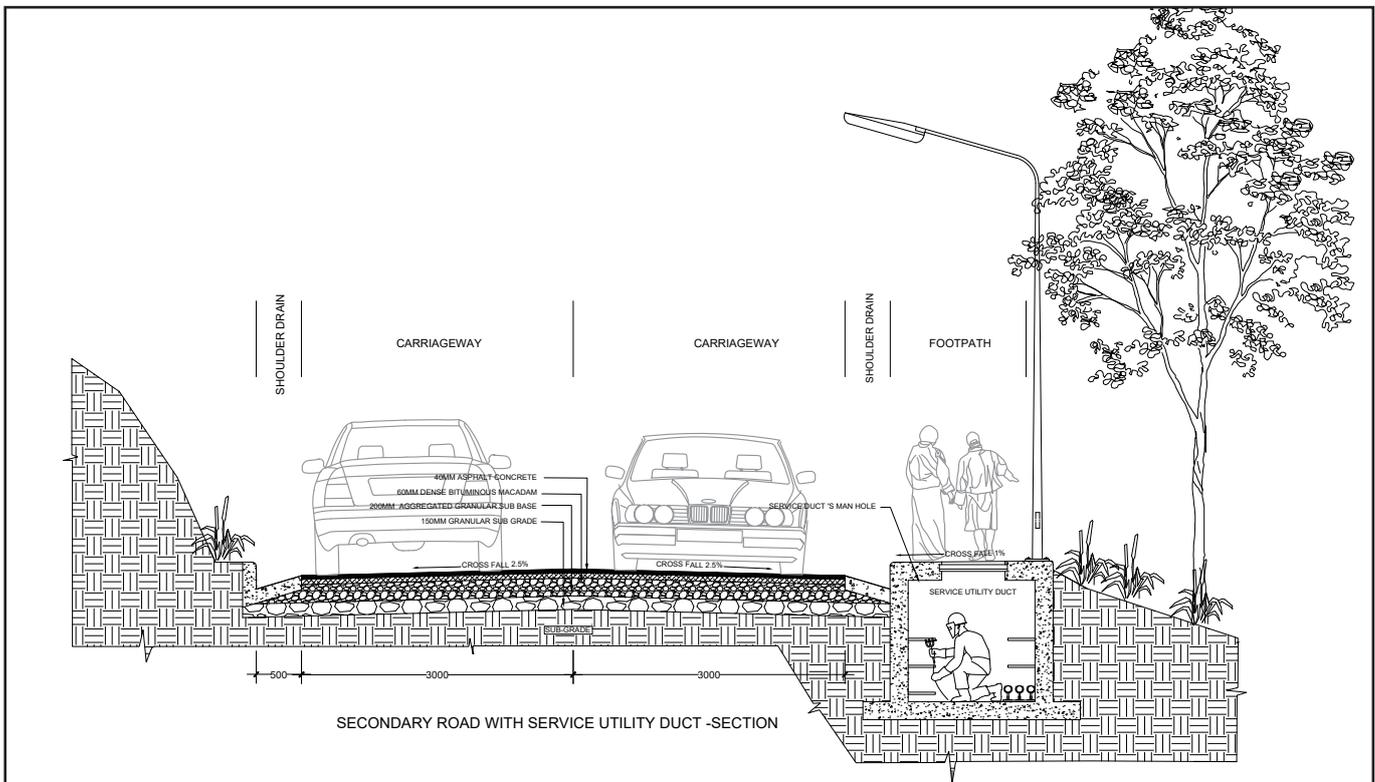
Secondary Road section with utility duct (at man-hole)
